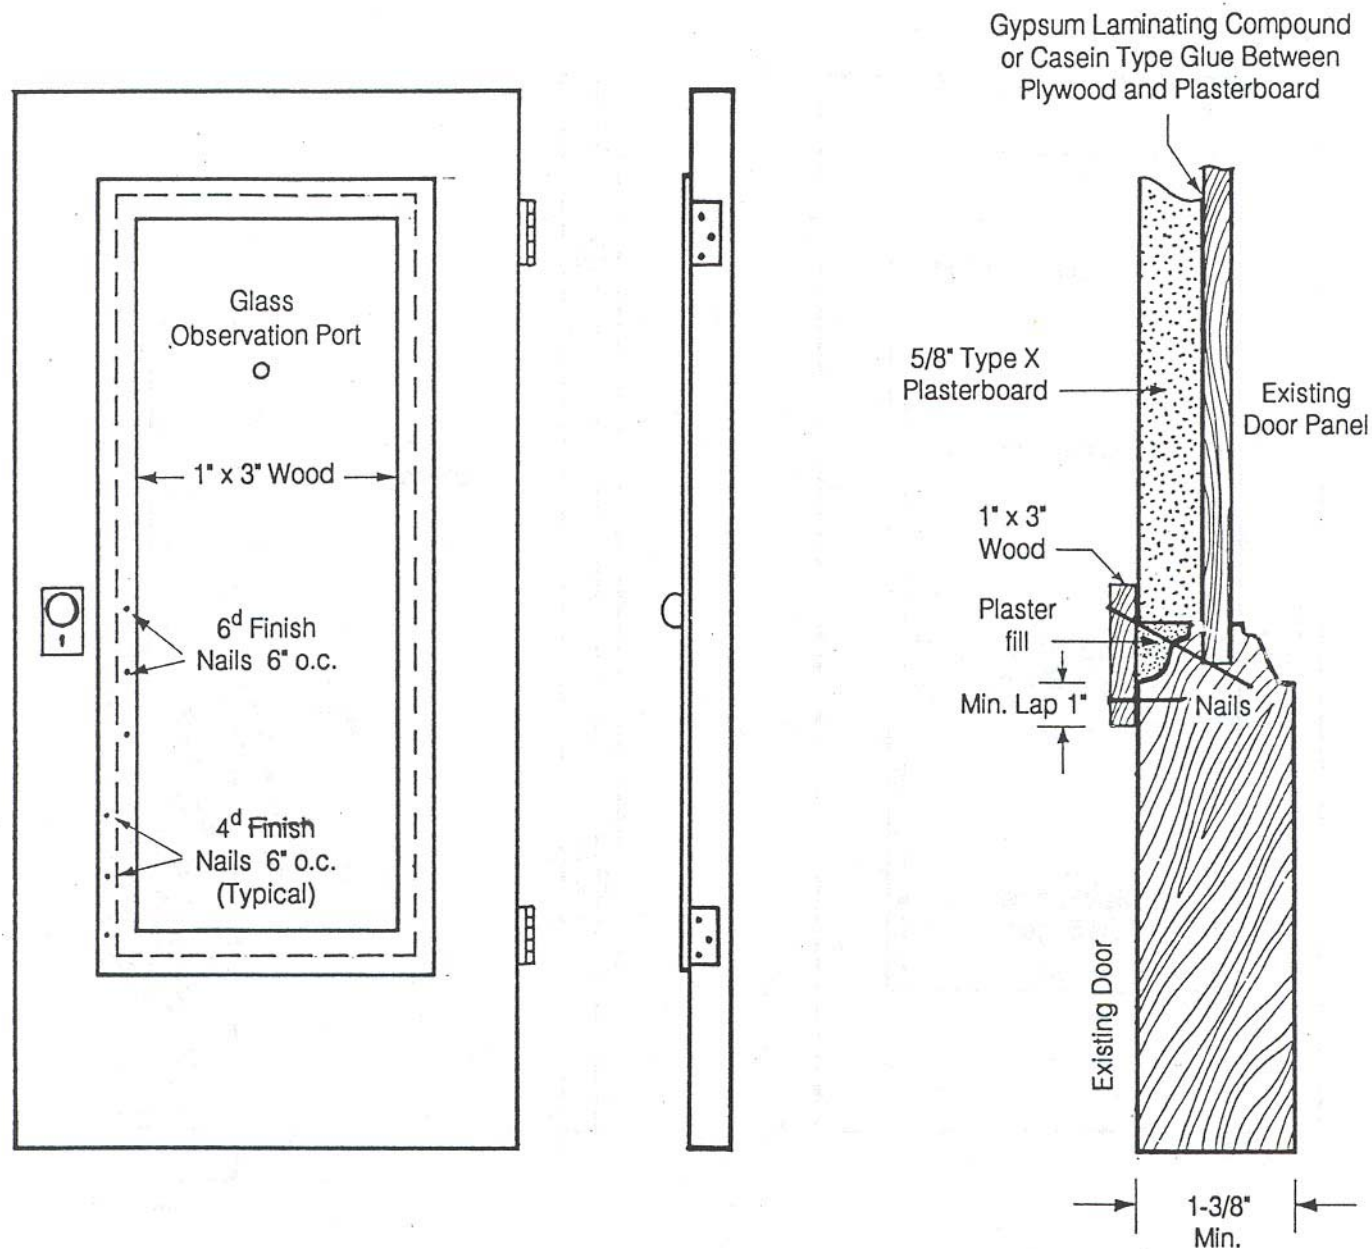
Acceptable Alternatives to 20-Minute Corridor Doors
